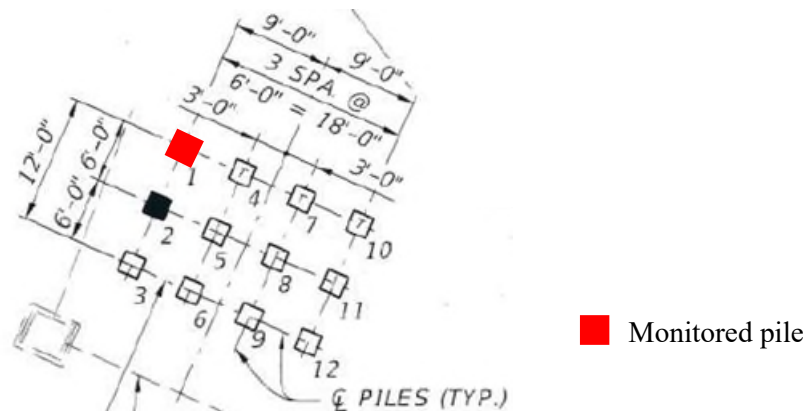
Detailed view of Pier 11 RT foundation layout at Site D.
